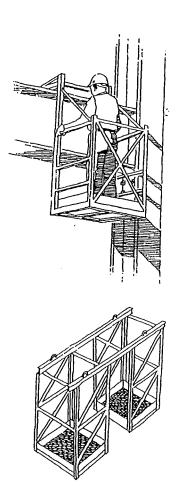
Lightweight Fabricated Hanging Working Platforms
